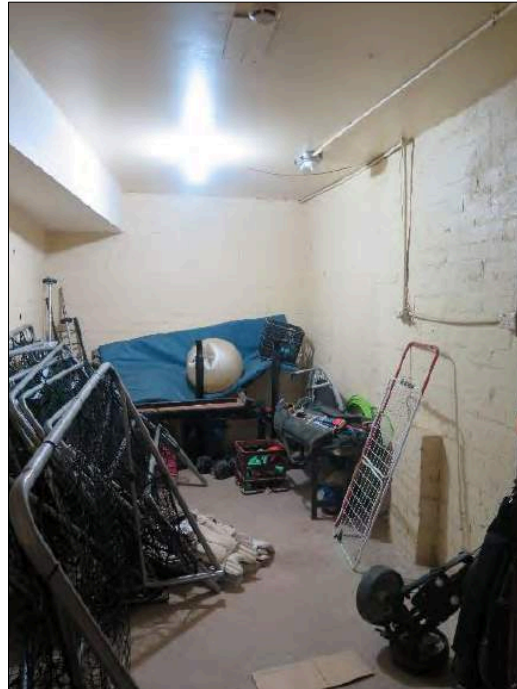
Room 124 in the CMP 2016. This room has painted brick walls (old opening infilled on the eastern side) and a concrete floor and ceiling. The door has been replaced.
